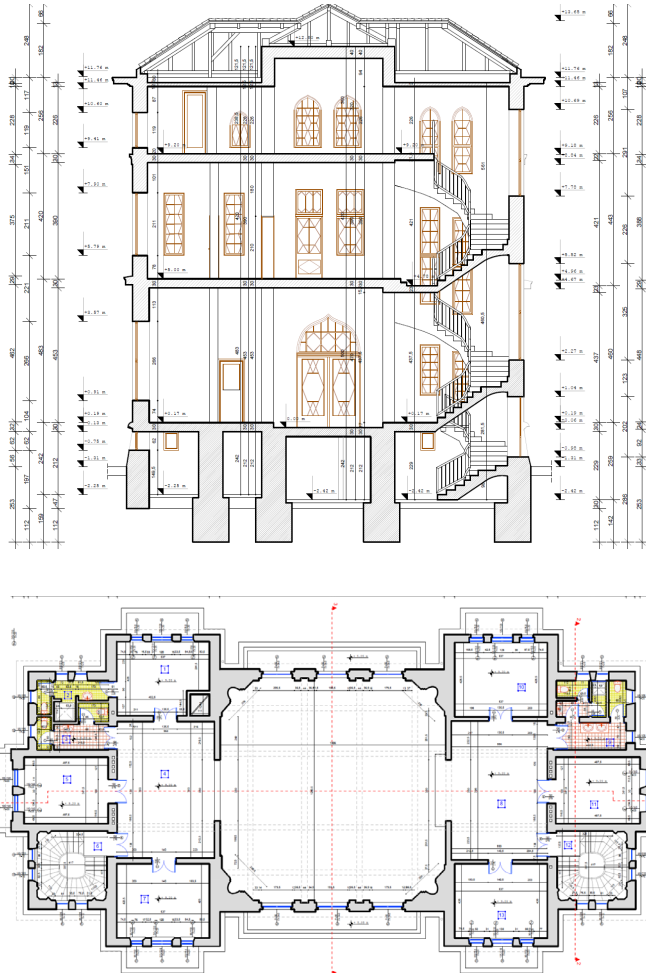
Planned situation after performing construction work on the House of Army in Bitola
